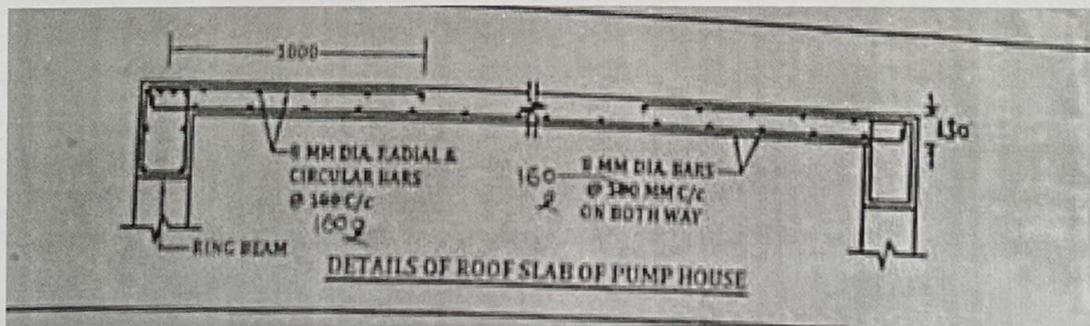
DETAILS OF RING BEAM AT ROOF LEVEL OF PUMP HOUSE :-
